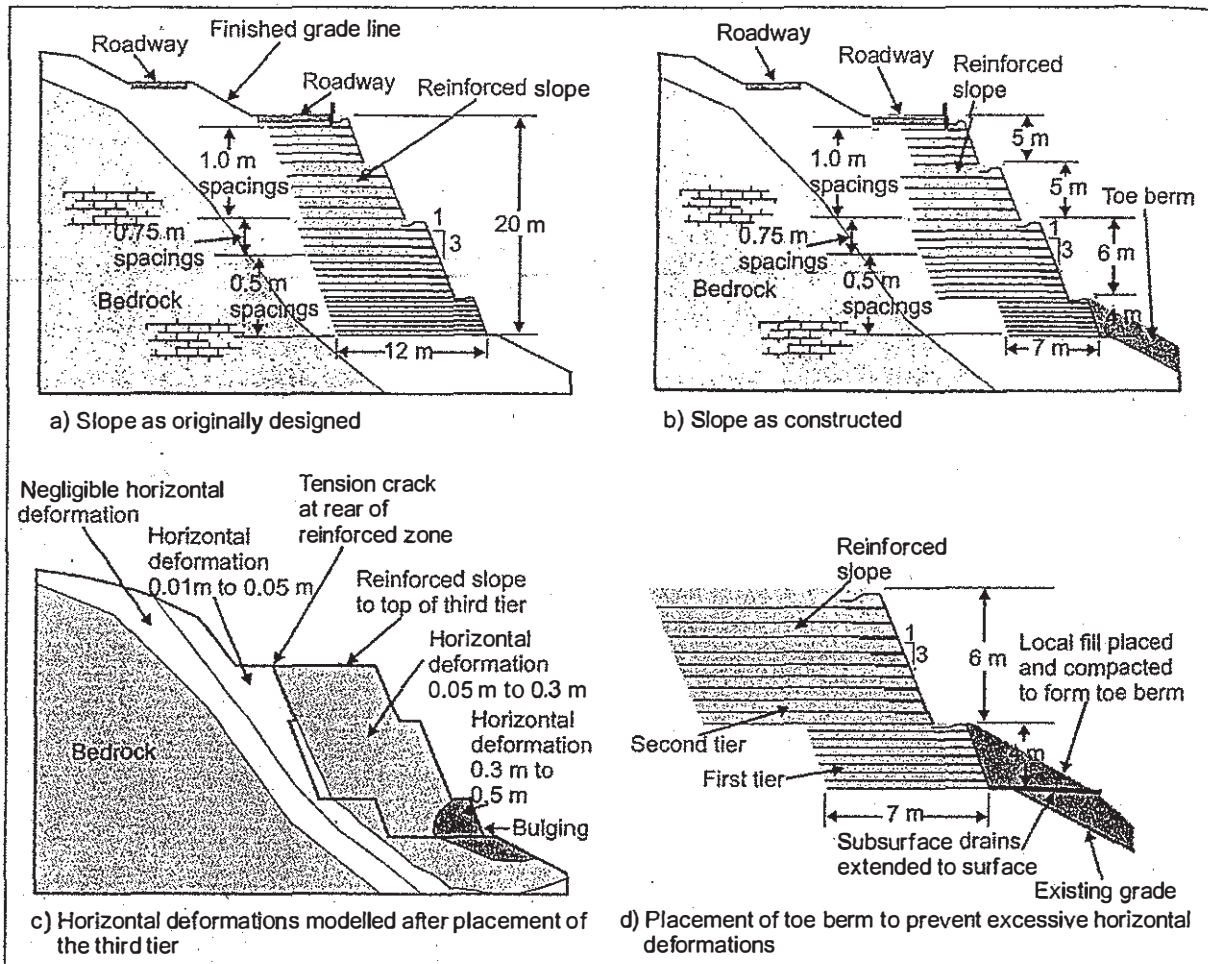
Reinforced fill slope, Linkou, Taiwan.
